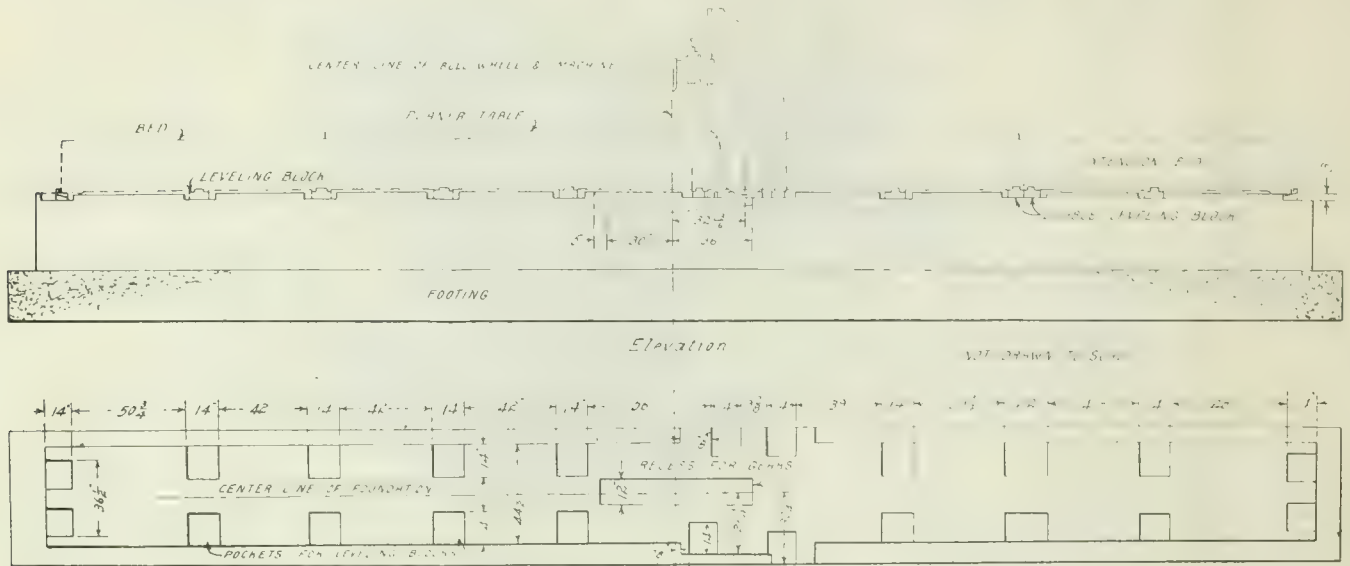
FOUNDATION FOR A 42 IN. X 36 IN. X 26 FT. CINCINNATI PLANER.
